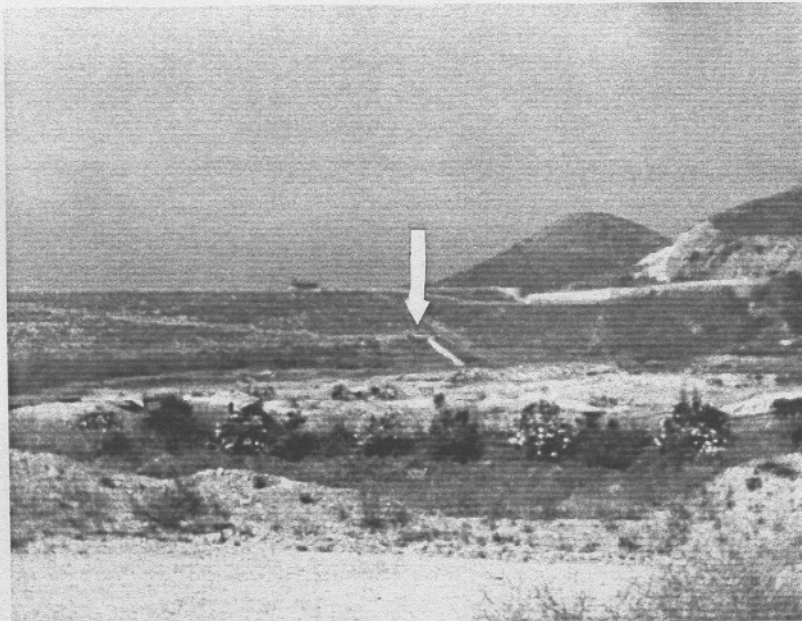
San Antonio Dam and Flood Control Basin showing outlet works and spillway. Looking Southwest.
